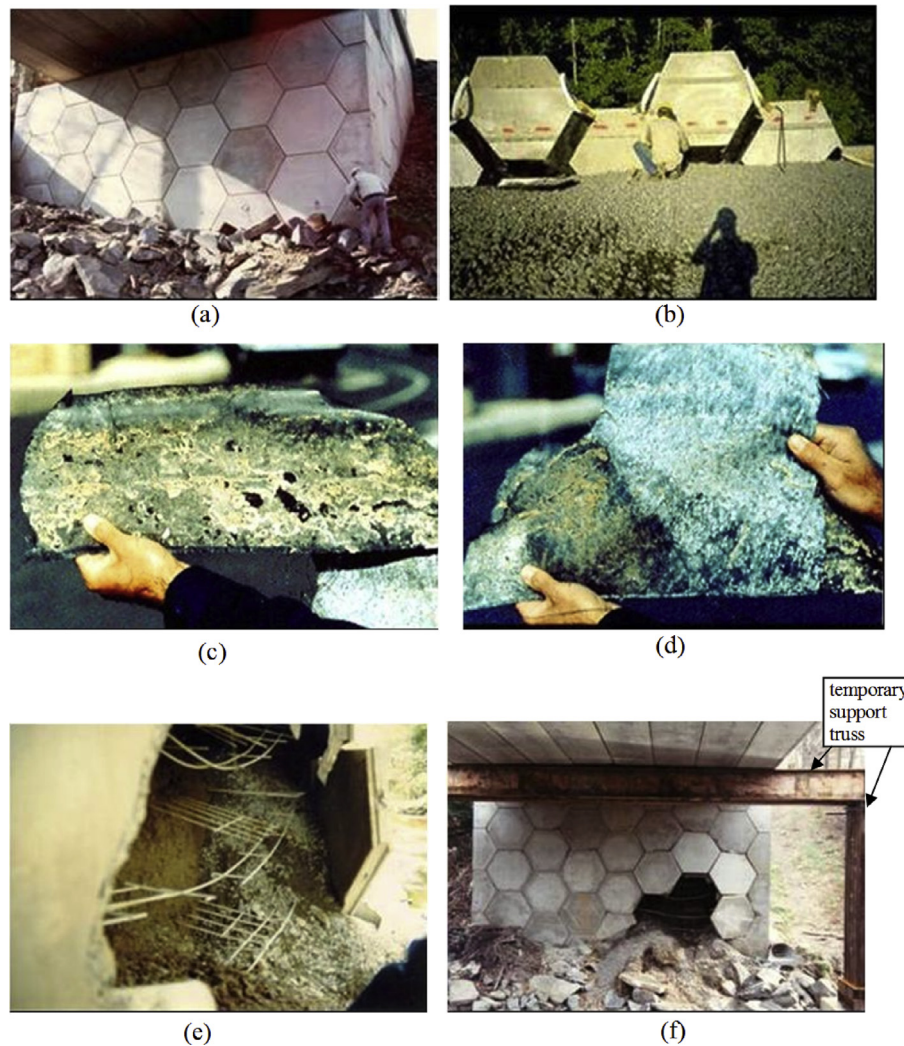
Case history of improperly installed geotextile filter causing bridge abutment failure. (a) Bridge abutment as constructed using hexagonal concrete panels, (b) Geotextile filter strips over openings, (c) Sample of pieces of completely glue-sealed geotextile "filter", (d) Another sample of a piece of completely glue-sealed fabric, (e) Close-up of failure showing steel grid reinforcement of concrete panels, (f) Abutment failure showing temporary steel support truss support bridge girders. After GSI, 1989.
